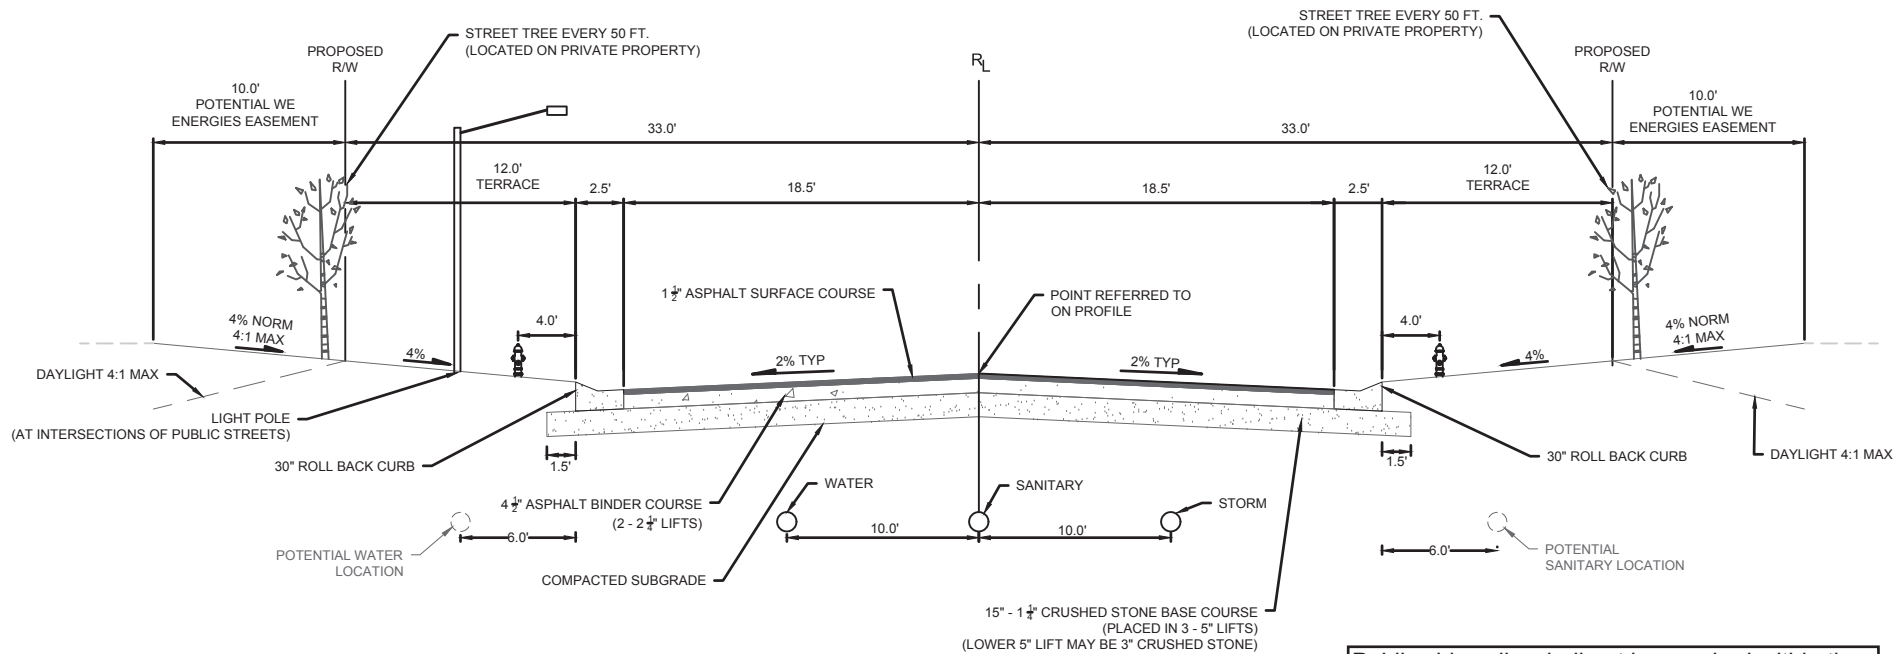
Exhibit B: South Hills Commerce Center, Proposed Roadway Typical Section, dated
